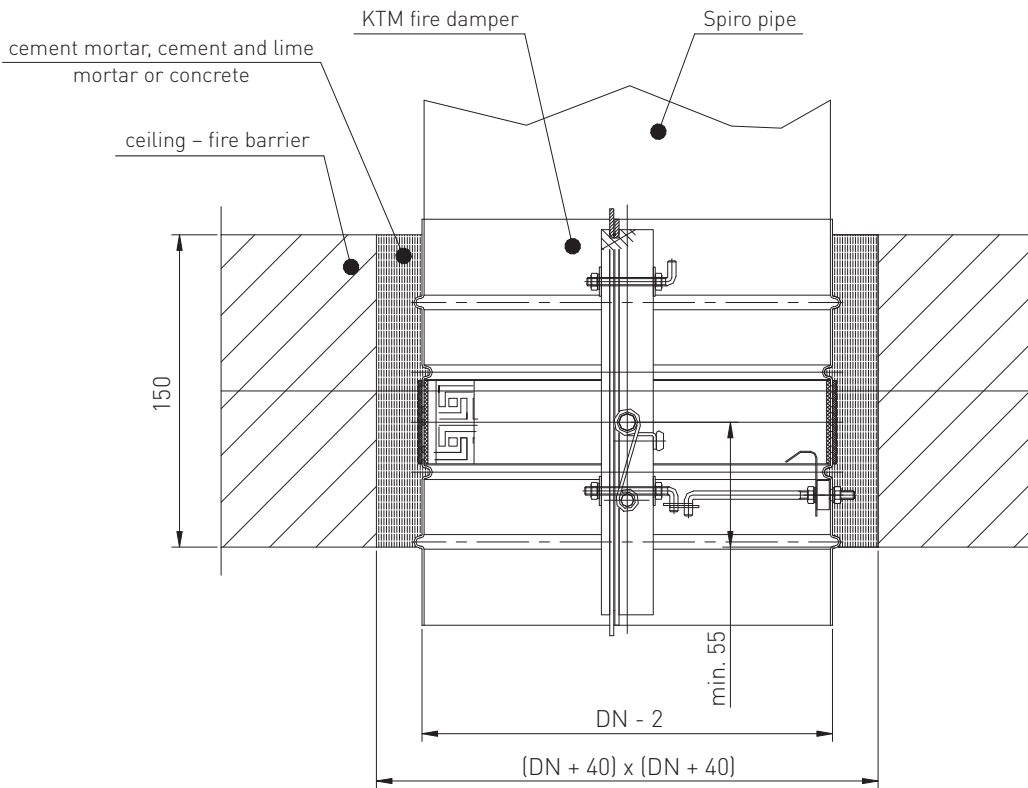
Installation of KTM fire damper (male coupling) in rigid ceiling partition
